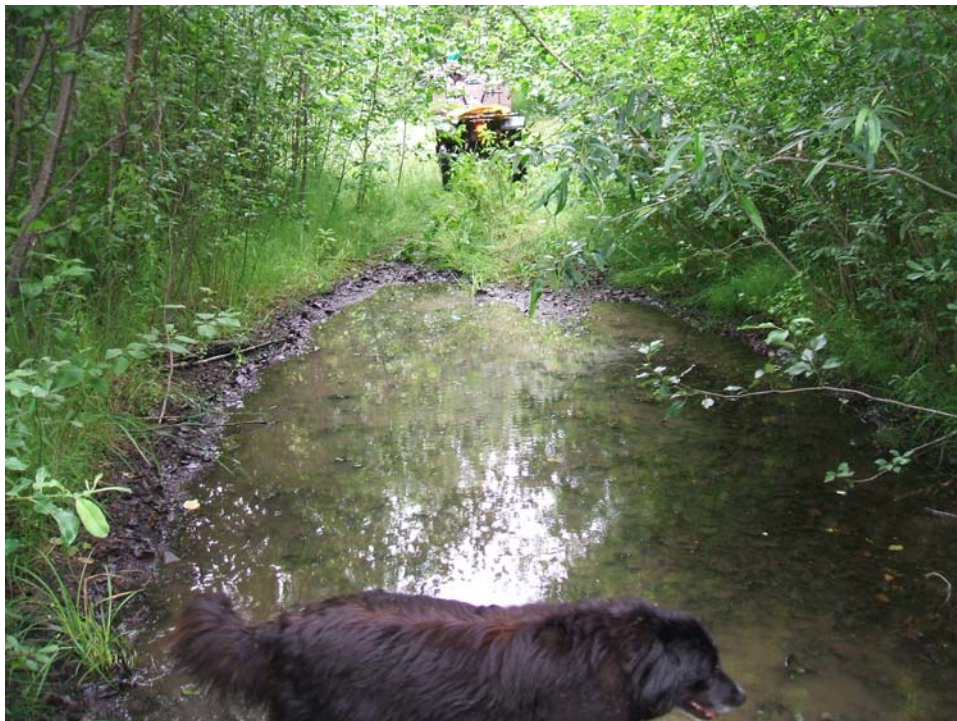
Water flowing over the road at Site 40, Wagon Creek Road.
